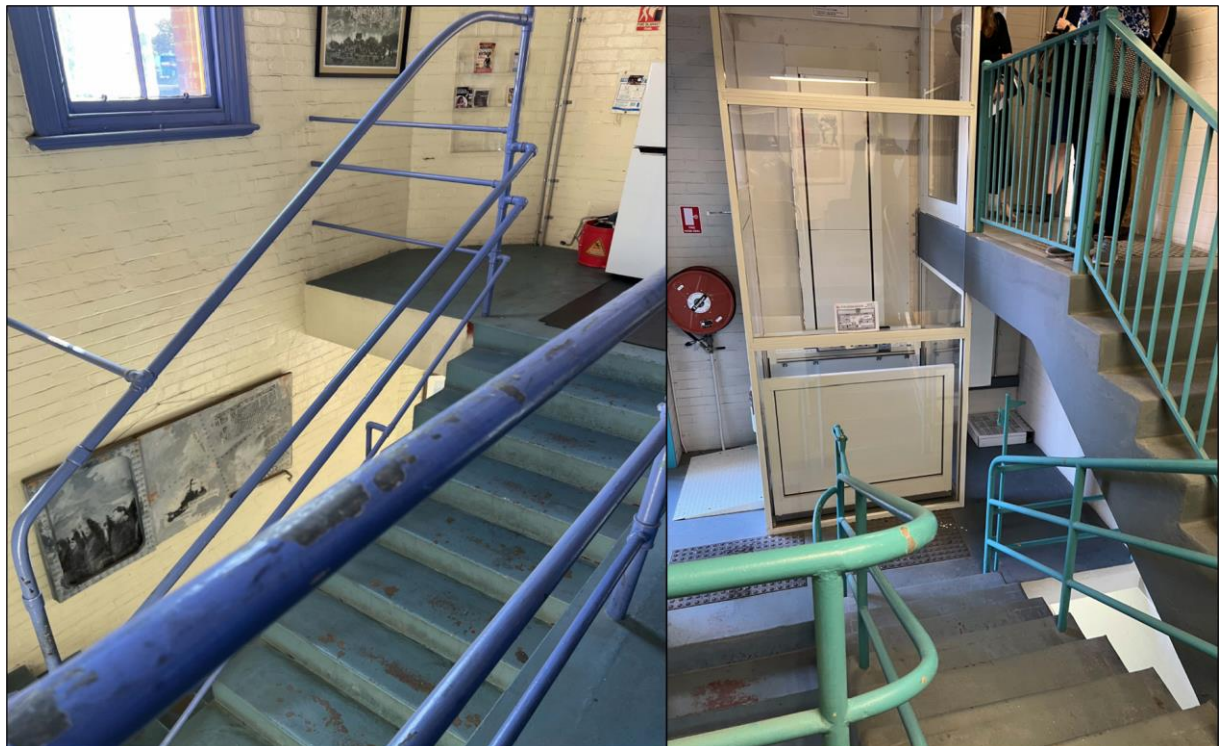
| Access to first floor, central building at Gordon Street site (Source: Department 2022)
